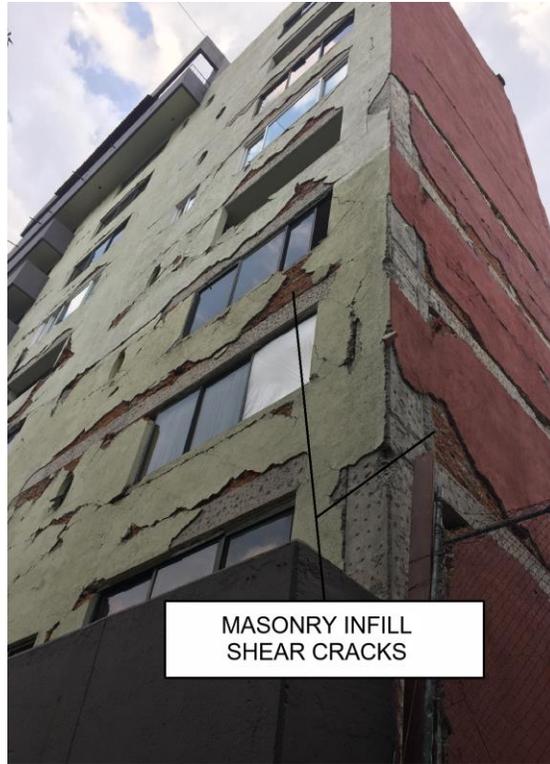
Masonry Infill Exterior Wall Damage (Line 1)
